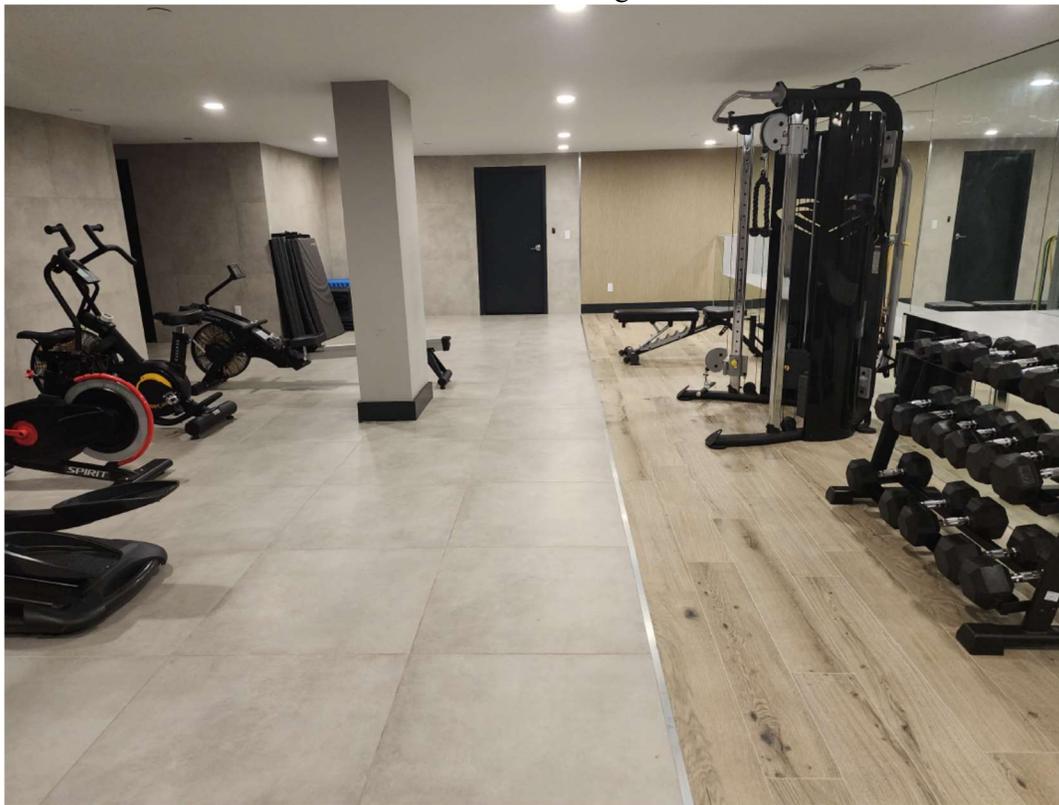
View of floor covering in accessory spaces in the cellar area.
